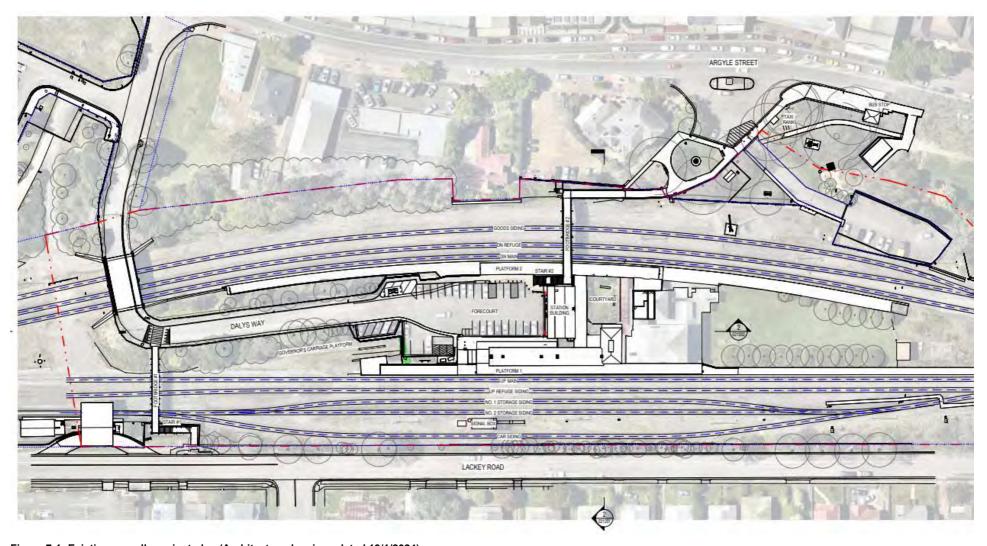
Existing overall precinct plan (Architectus, drawings dated 19/1/2024)
